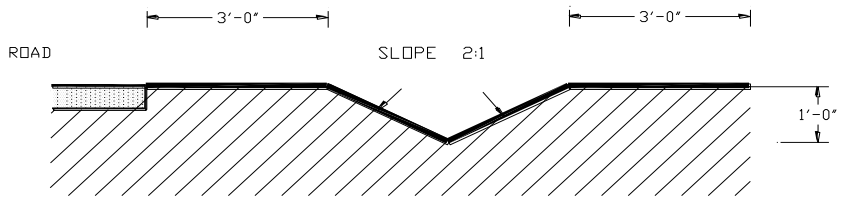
TYPICAL SECTION OF " V " DRAIN
